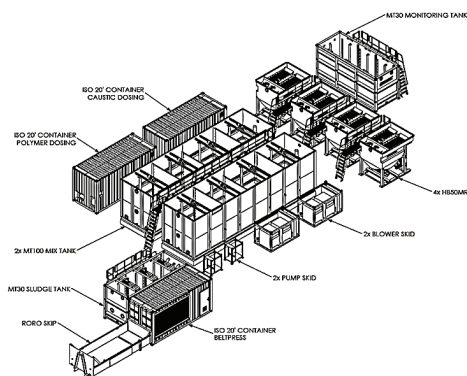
HDS Plant Layout Design Note. Install. included a plate and frame press, not a belt press.
